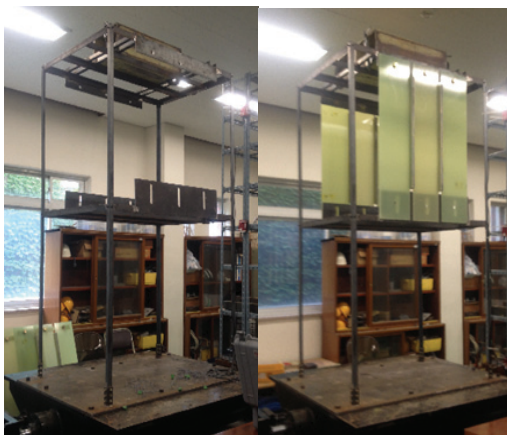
Sep up View of Steel-frame Specimen for Shaking Table Test
